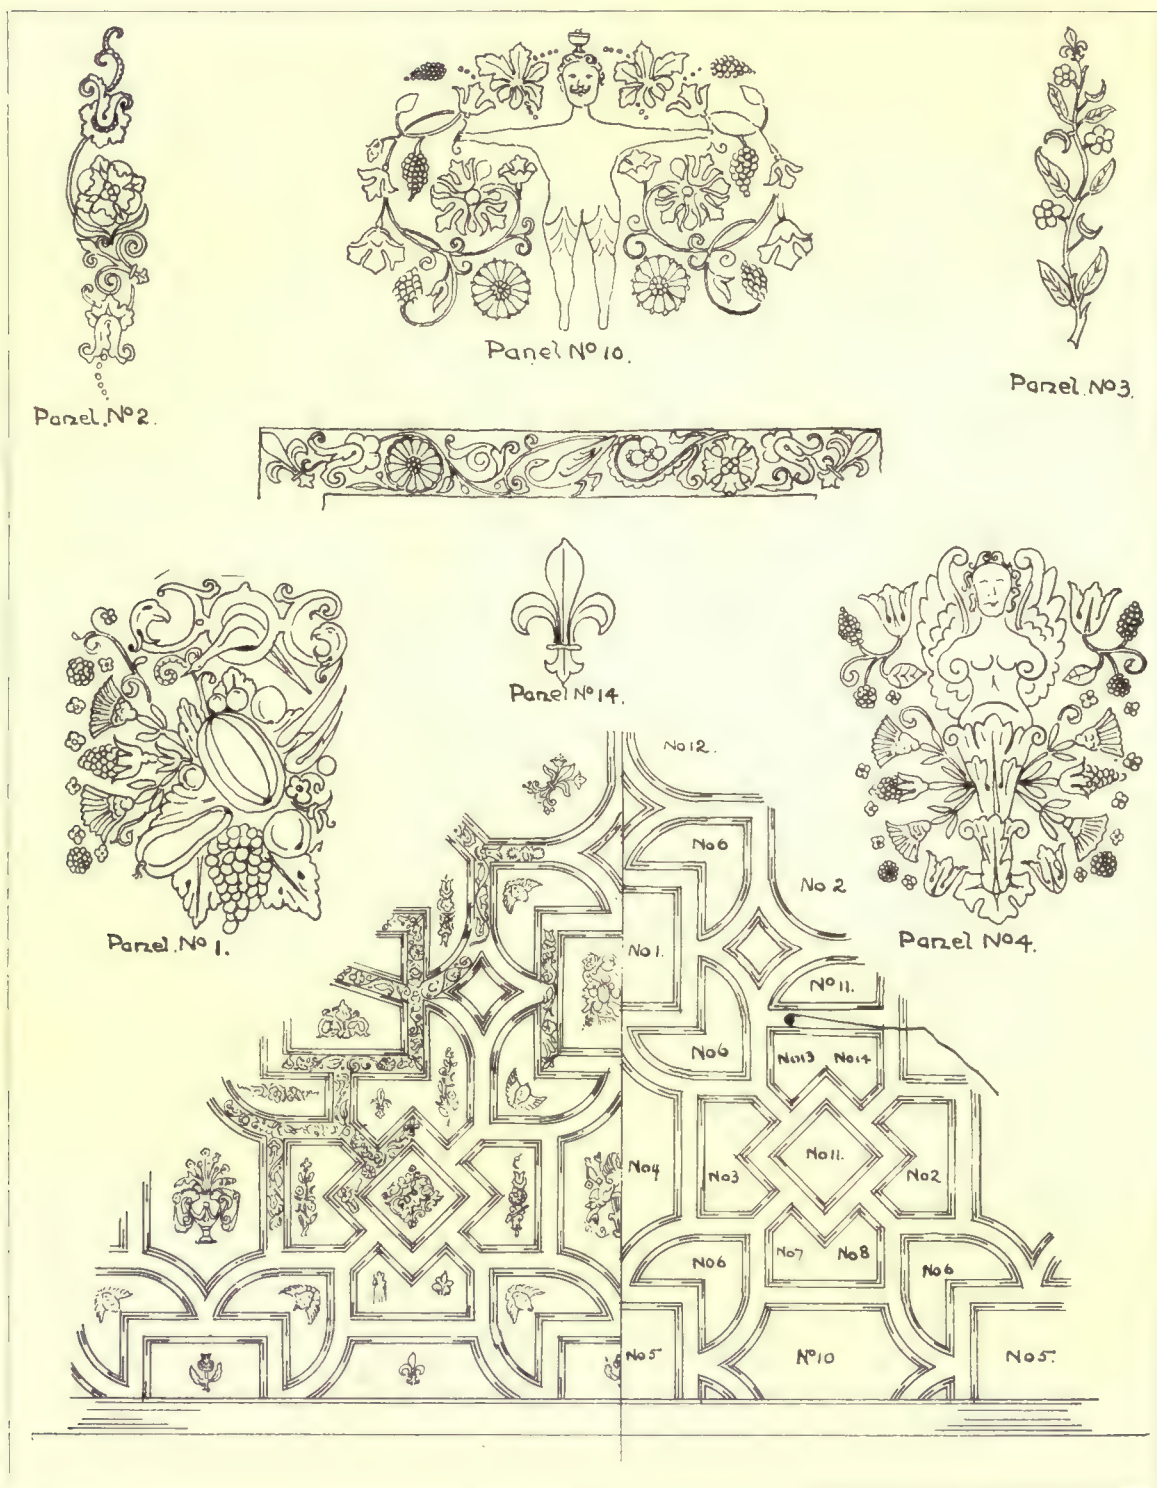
PART PLAN AND DETAILS OF FIG. 301 FROM MORAY HOUSE.
